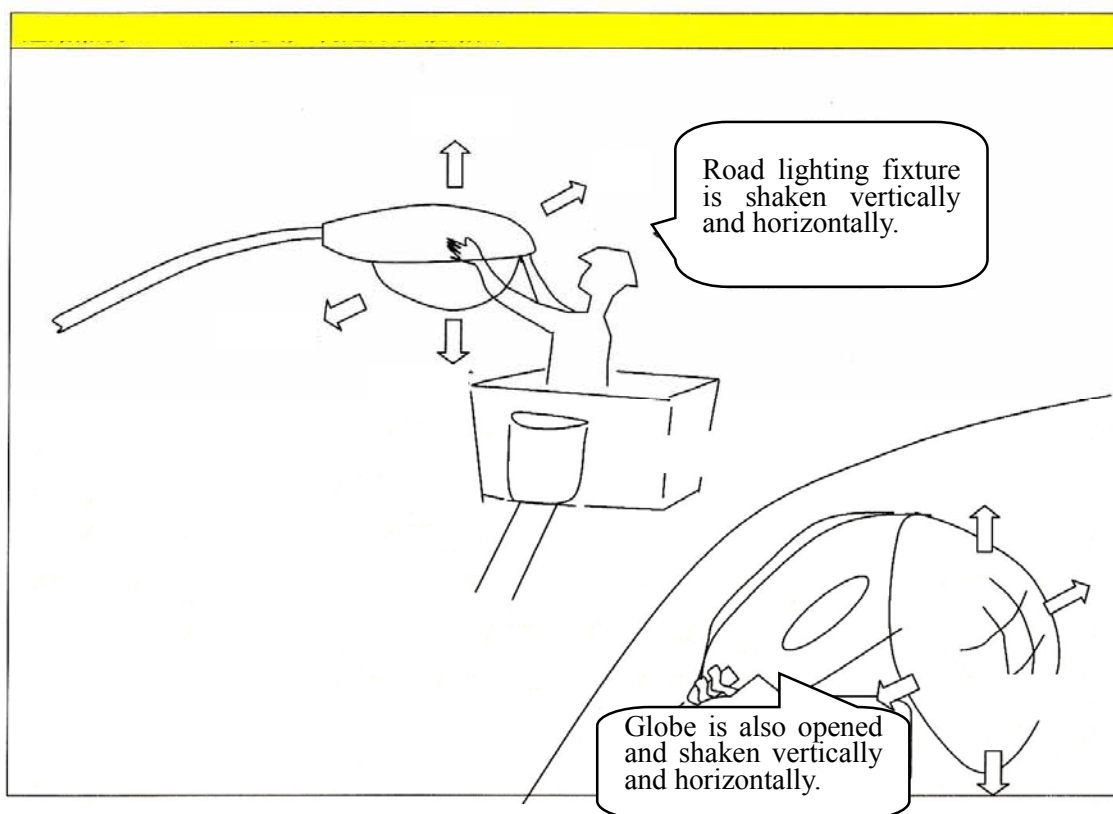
Schematic of close-up visual inspection of road lighting equipment
